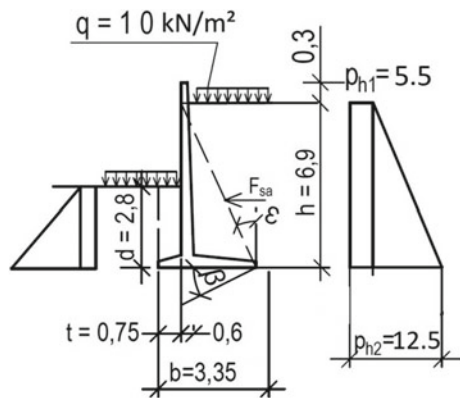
Retaining wall 1 arrangement along the A axis of the mixing chamber
